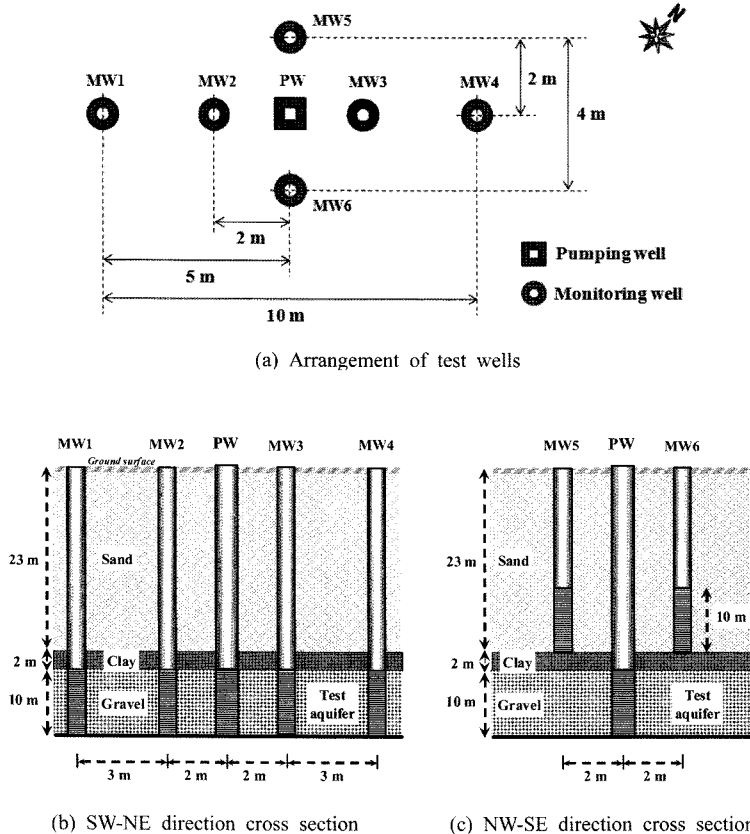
Arrangement and cross sections of test wells for pumping test.
